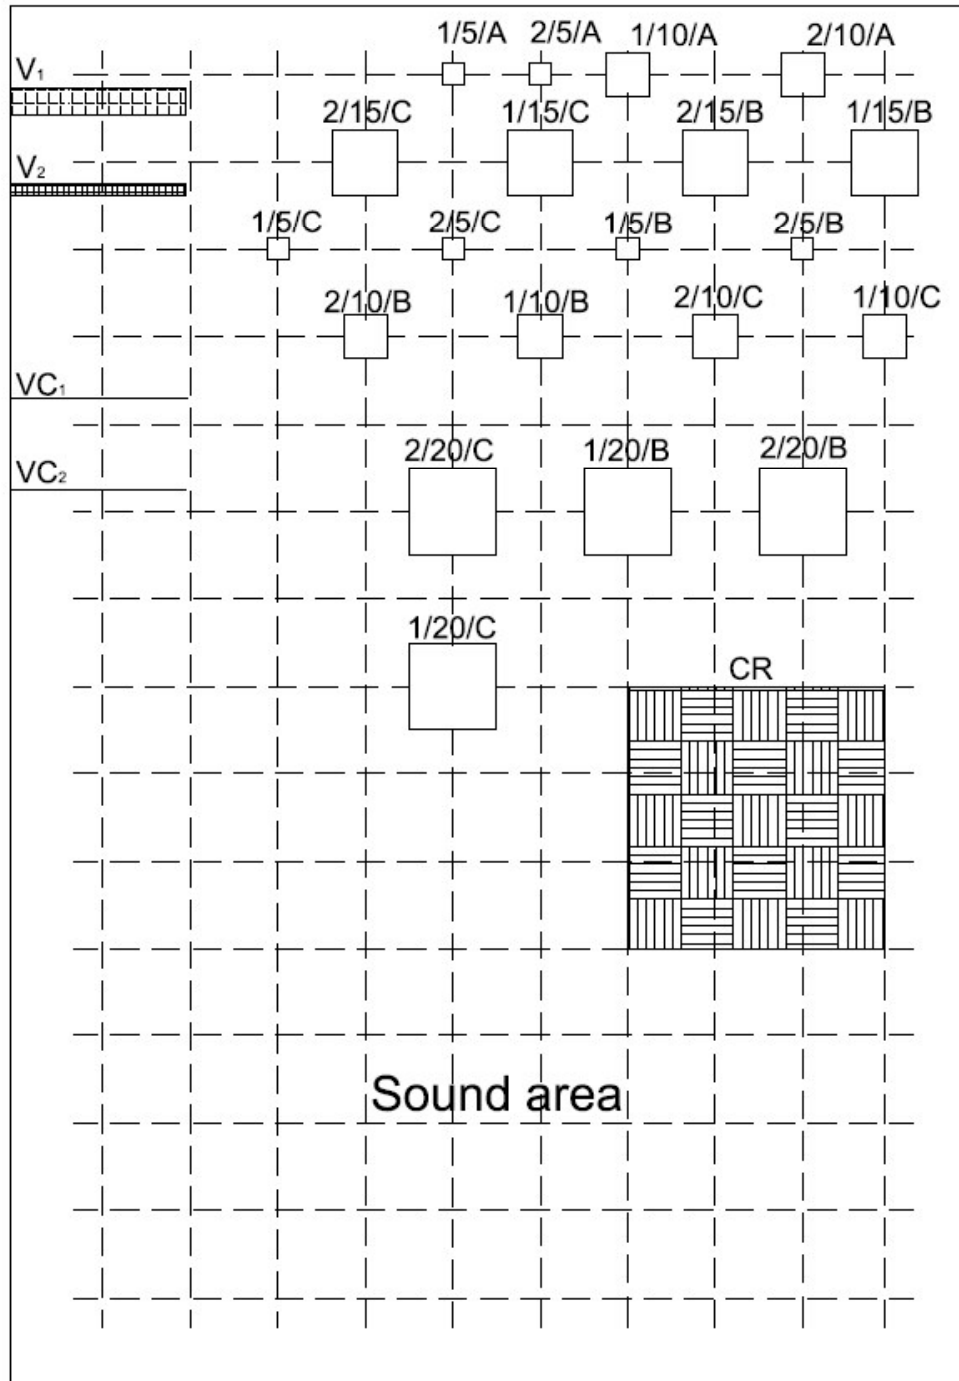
Design of concrete bridge deck slab at BITS Pilani – Pilani campus and defect distribution
